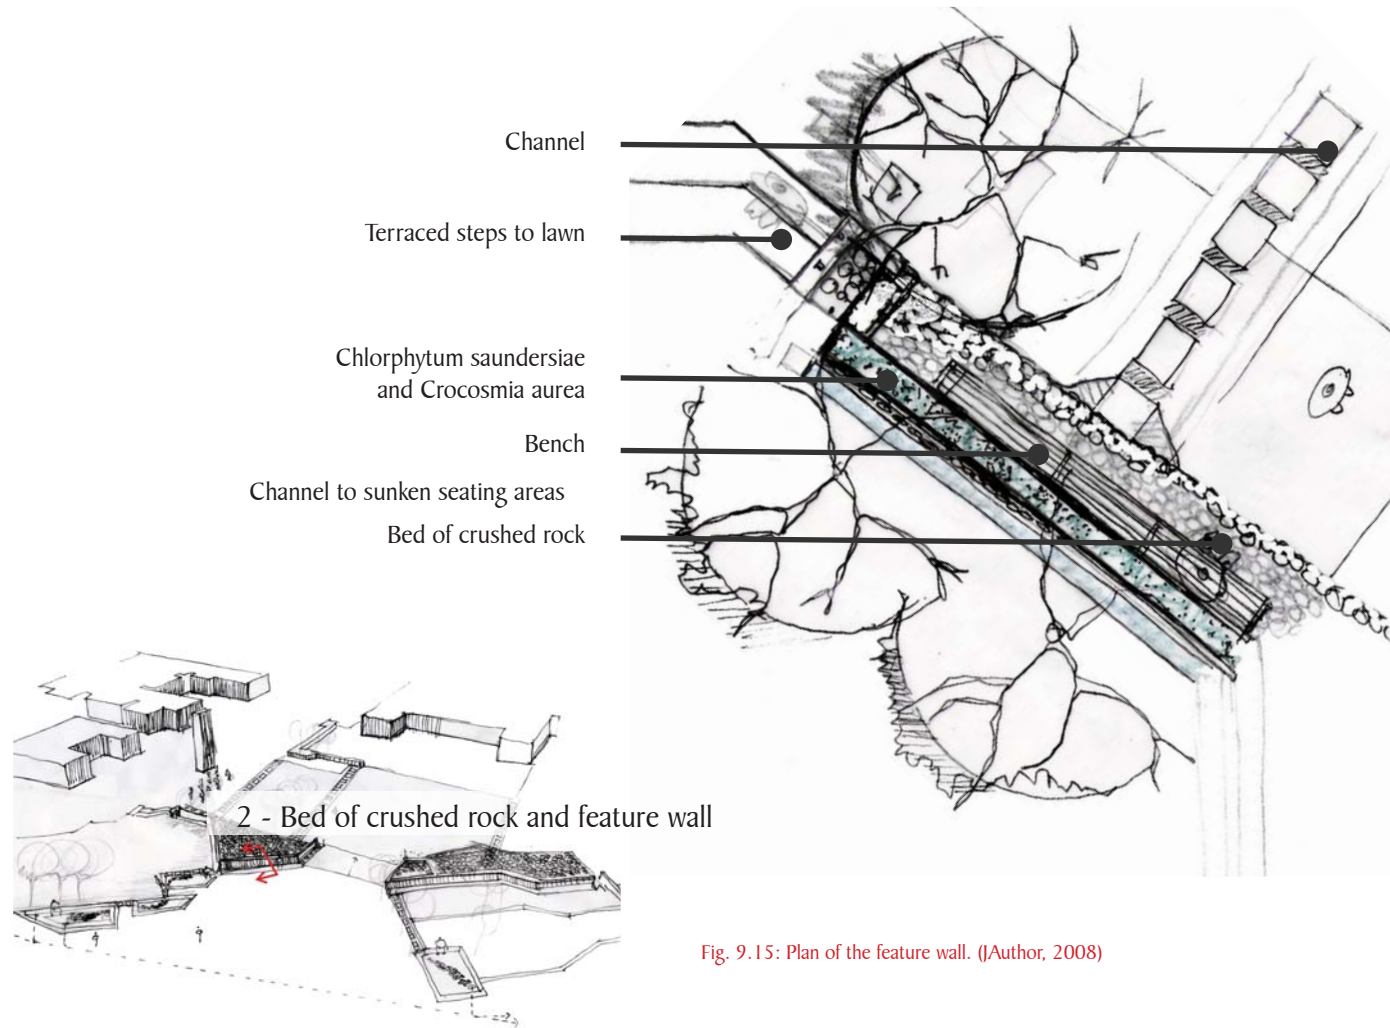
Plan of the feature wall. (Author, 2008)
